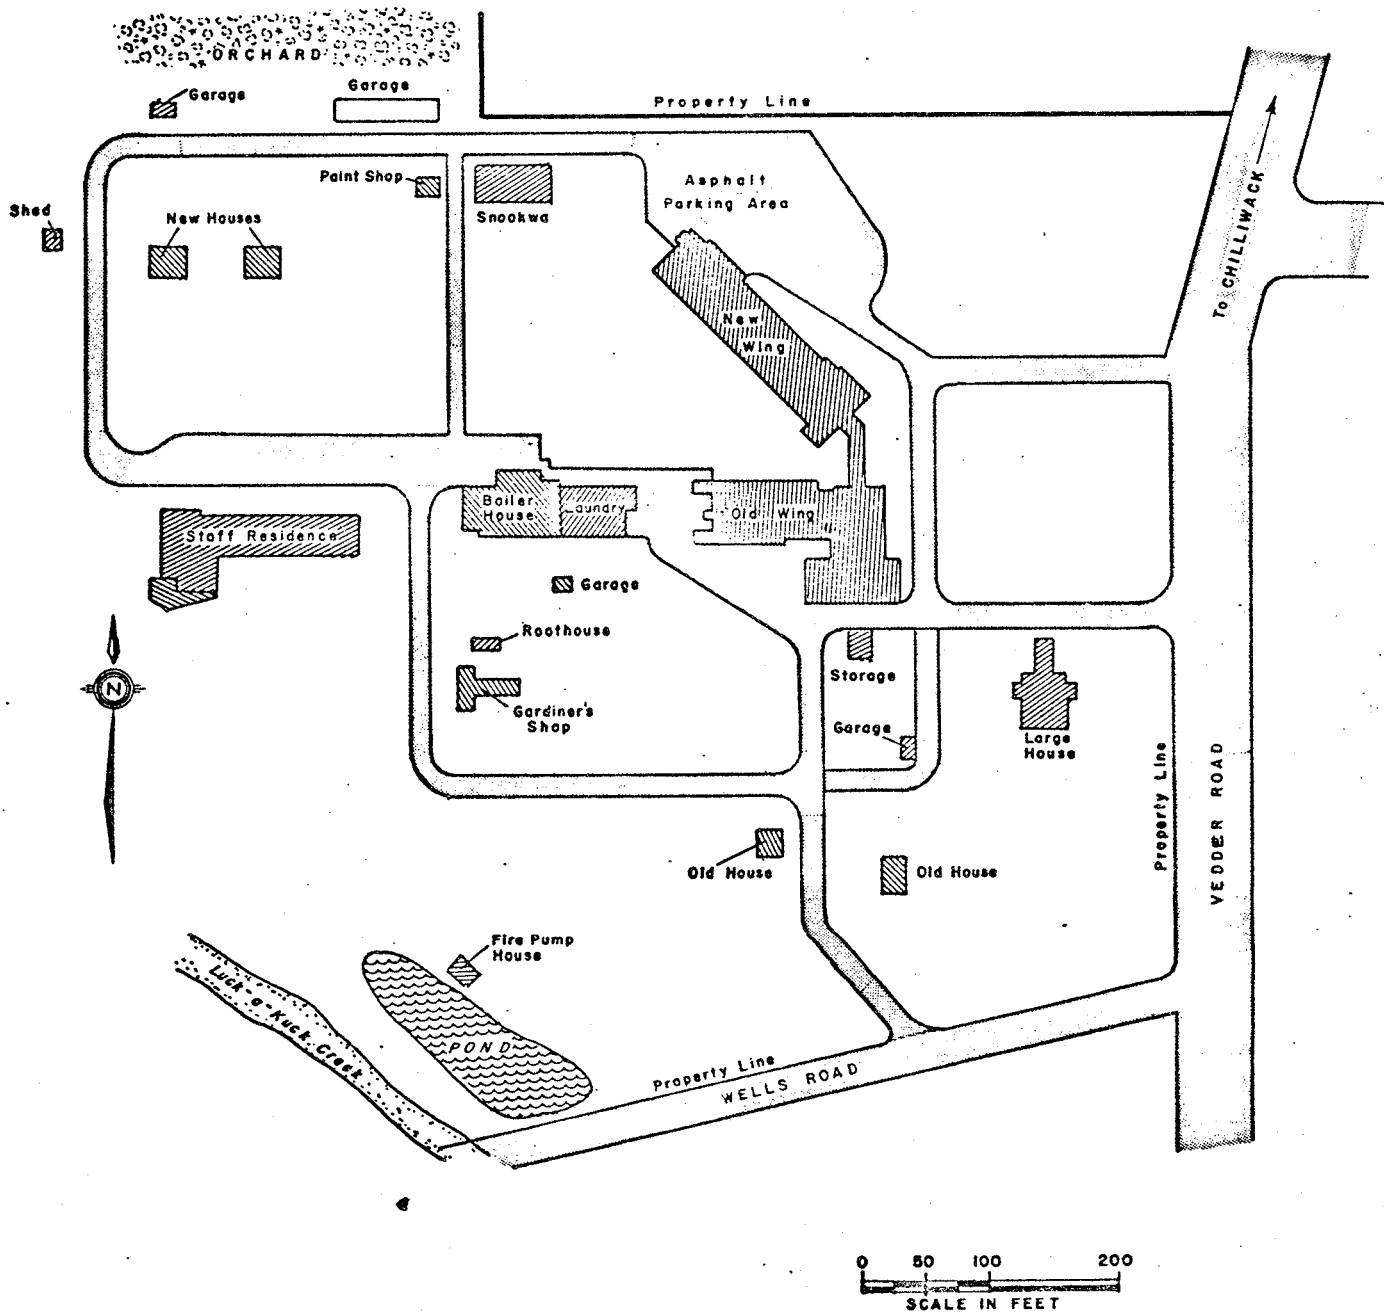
SITE PLAN - COQUALEETZA FEDERAL BUILDINGS AT SARDIS, B.C.
